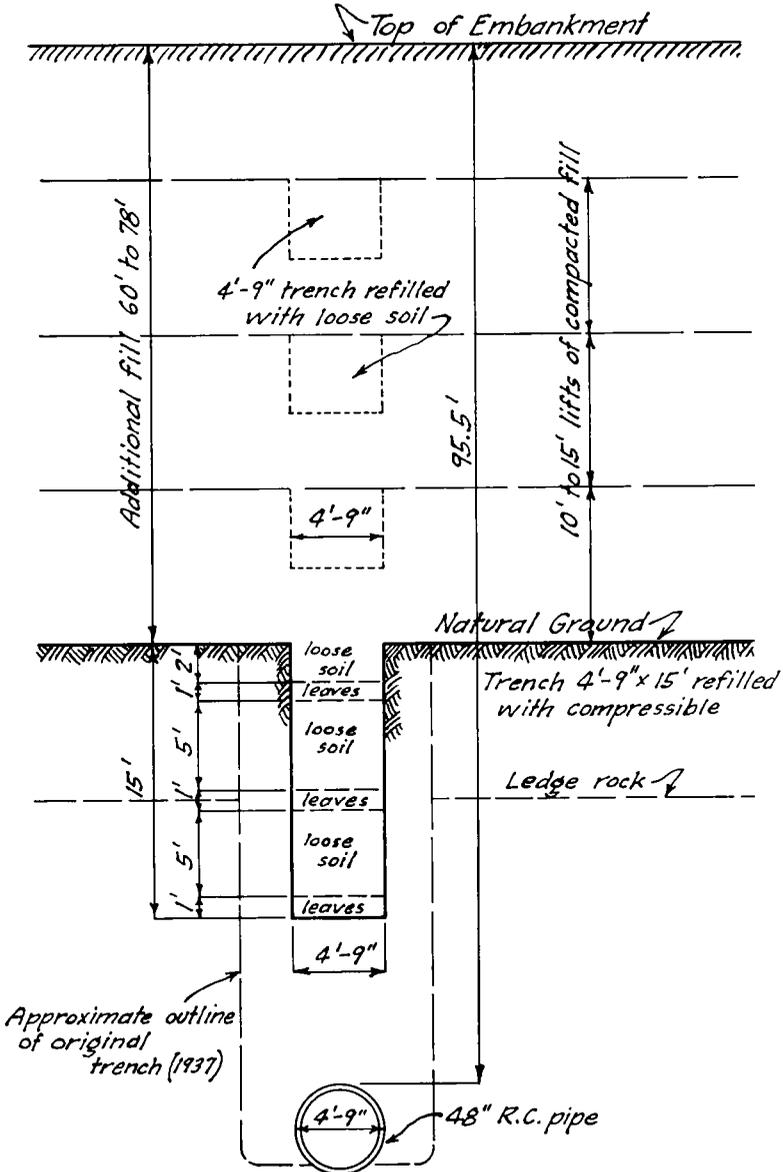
Typical cross-section of imperfect ditch method of constructing fill over Proctor Creek sewer, Atlanta, Ga.
